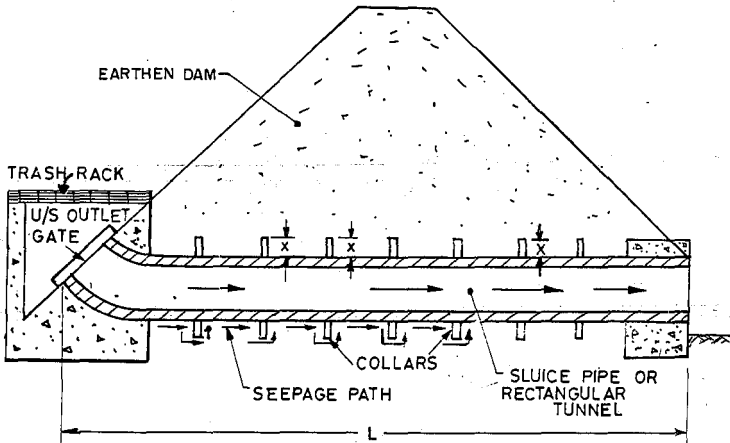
Typical outlet arrangement through an earthen dam.
